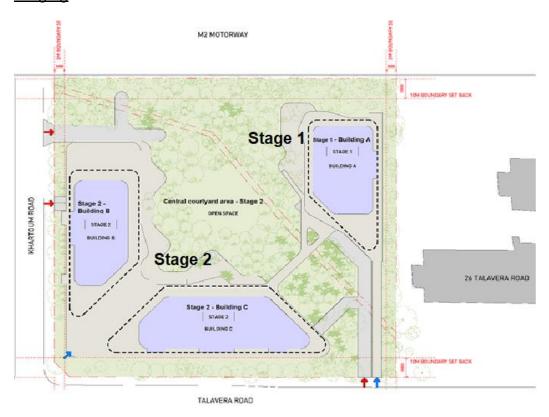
Proposed staging of the 3 commercial buildings and the central open courtyard area.
